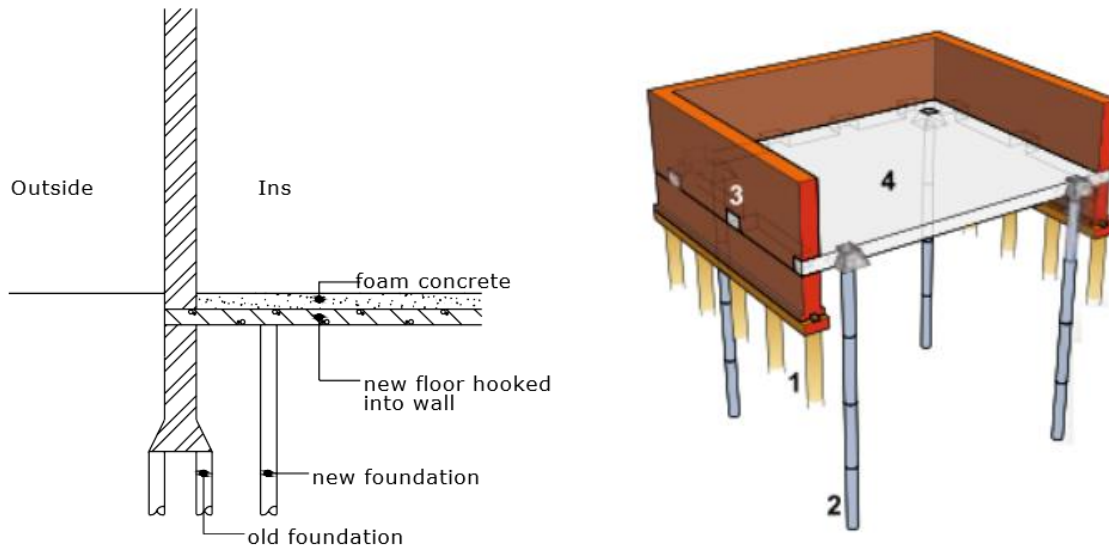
Left: schematic section of Board Construction; right: 1) old wooden piles, 2) new piles, 3) support for the new "board", 4) new reinforced concrete floor (van Etten et al., 2007; VROM, n.d.)
